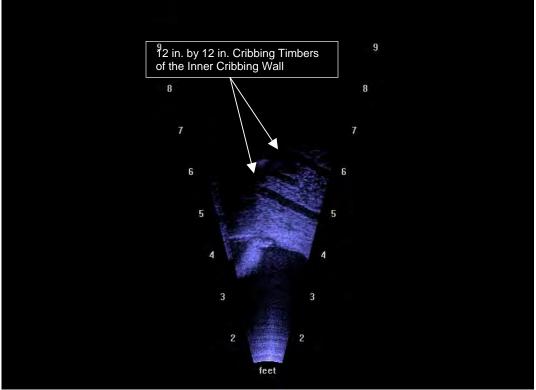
Sonar image from interior of void showing inner wall timbers in place.
